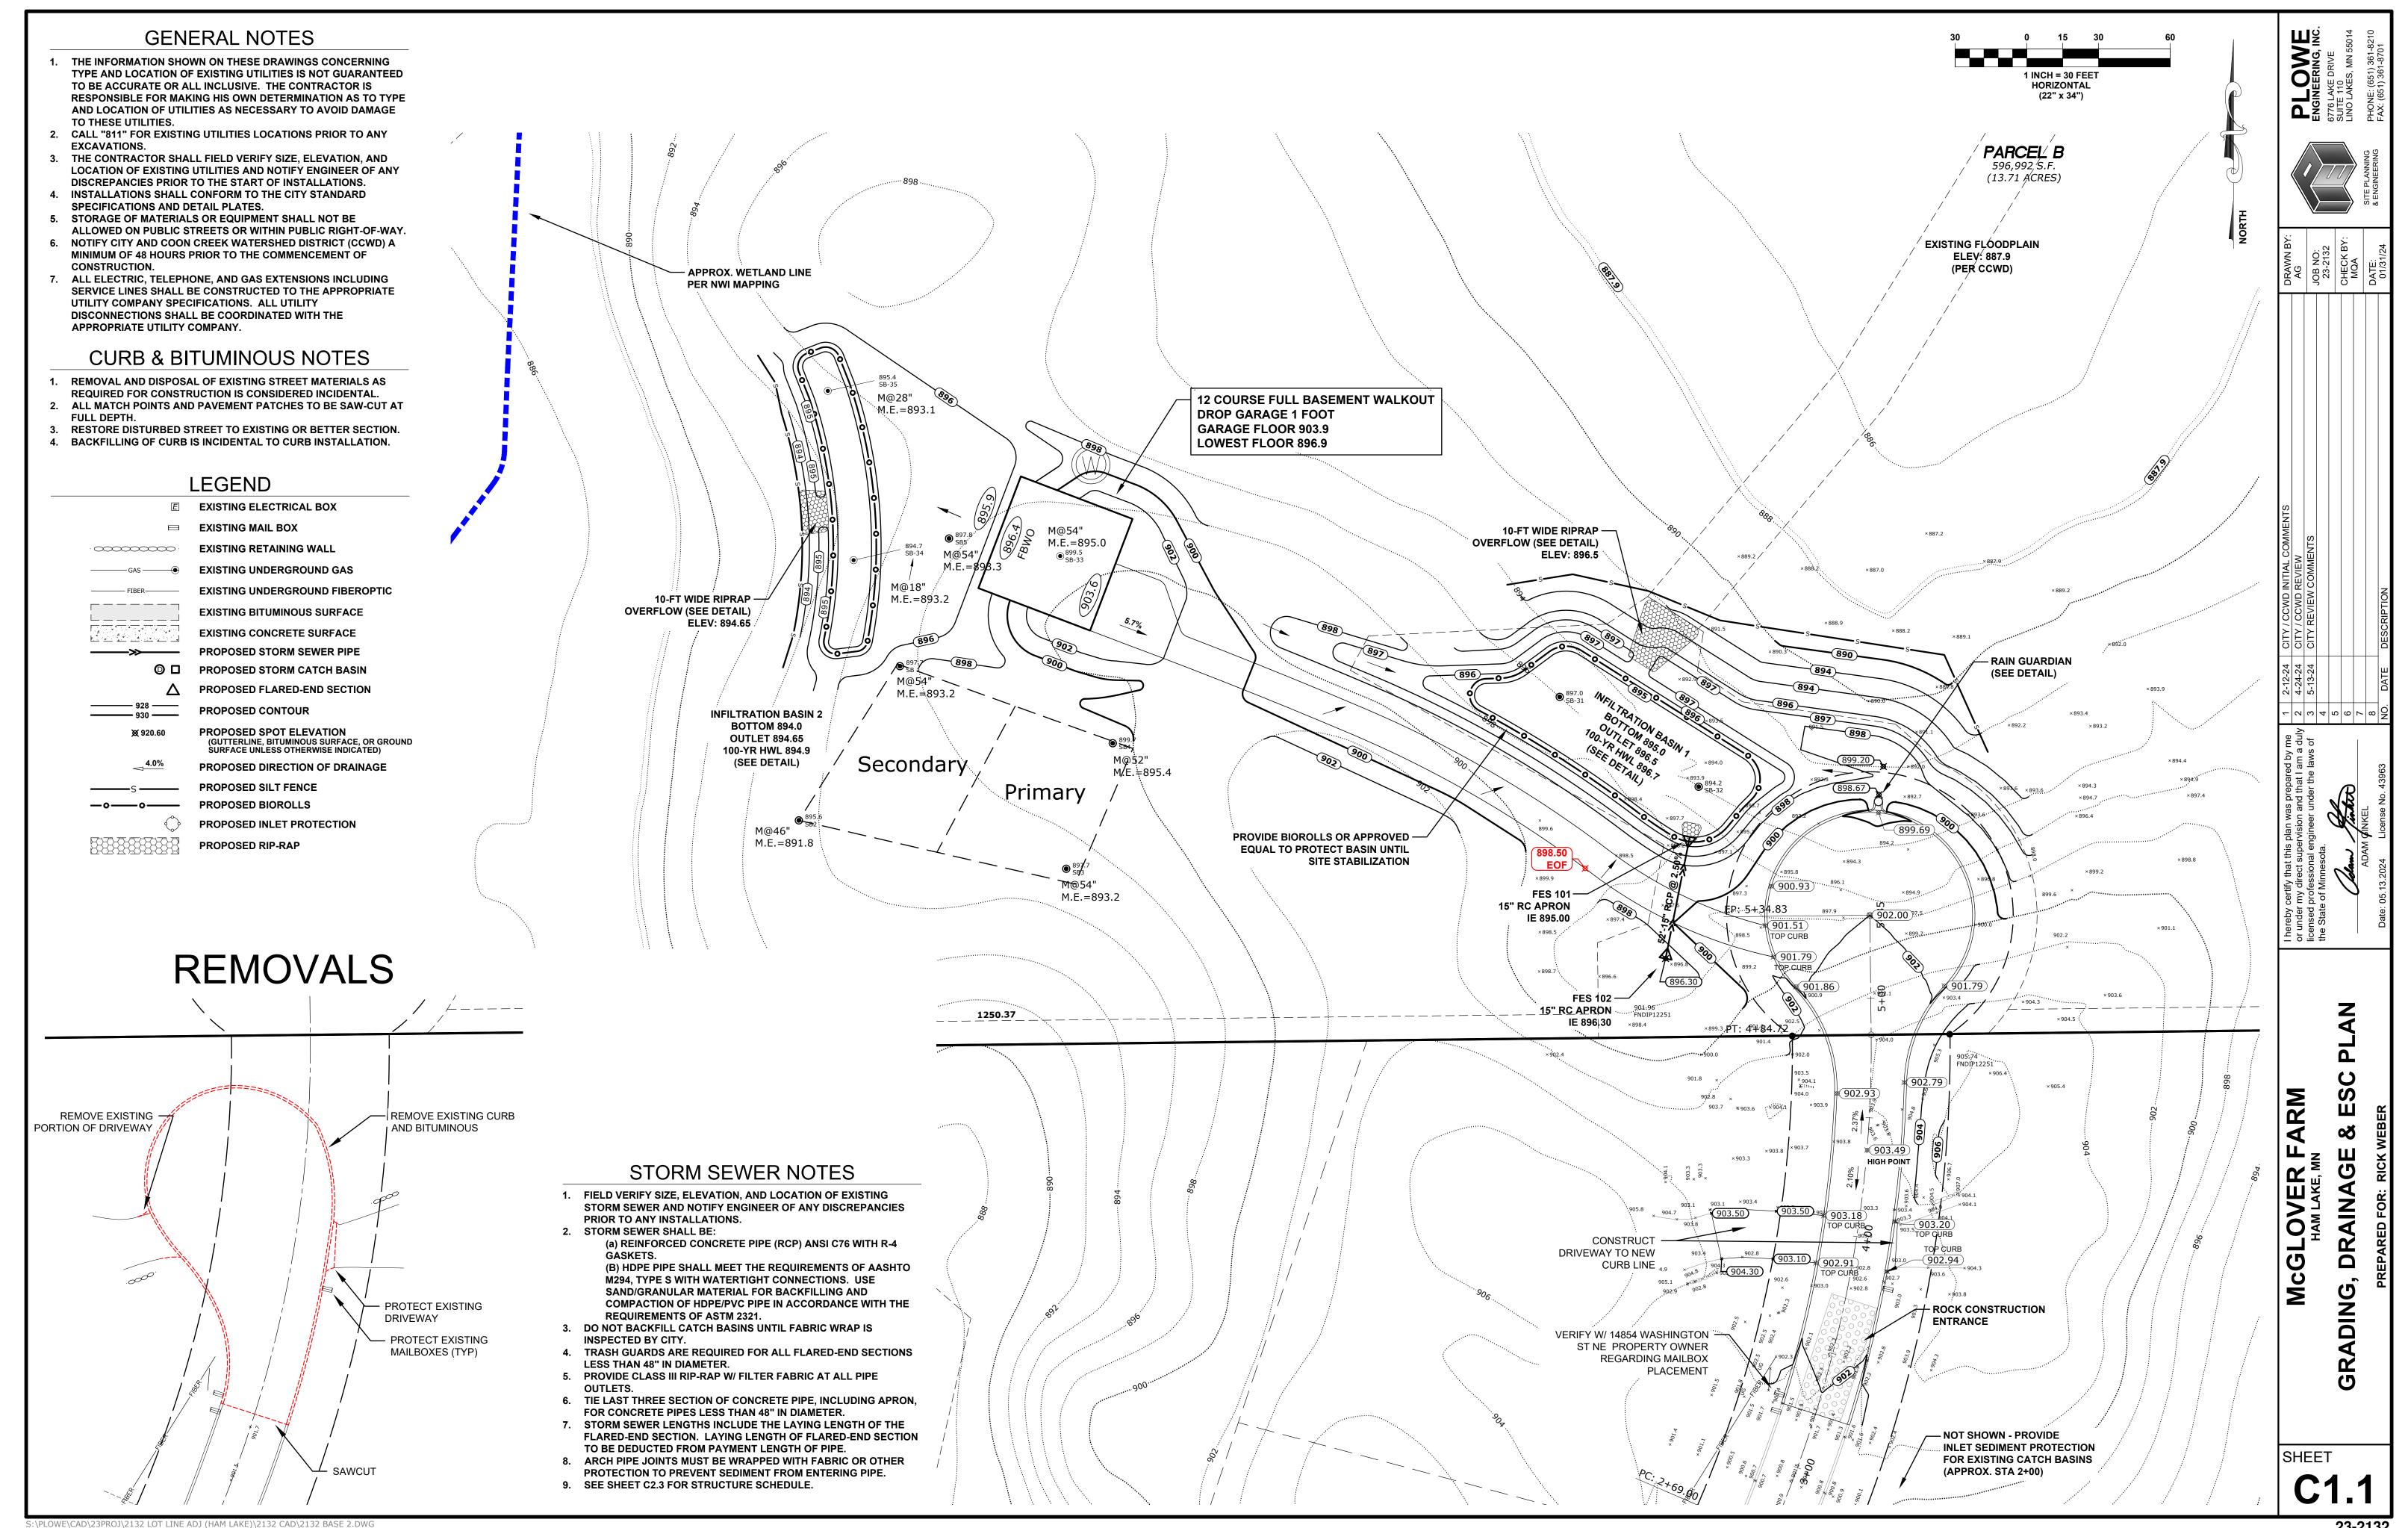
& 3: Site Plan and Erosion & Sediment Control Plan
